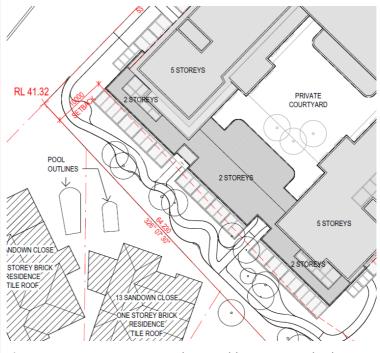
Extract DA030B Site Plan – Building A 10m setback.
